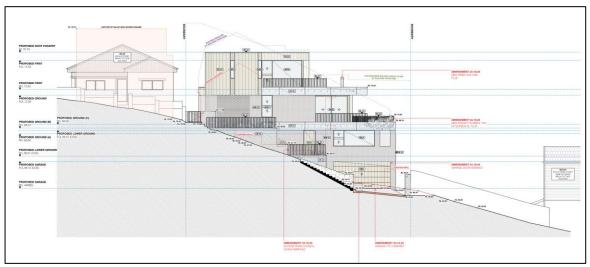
Extract of proposed street elevation (Source: Baikie Corr Architecture and Interiors)
